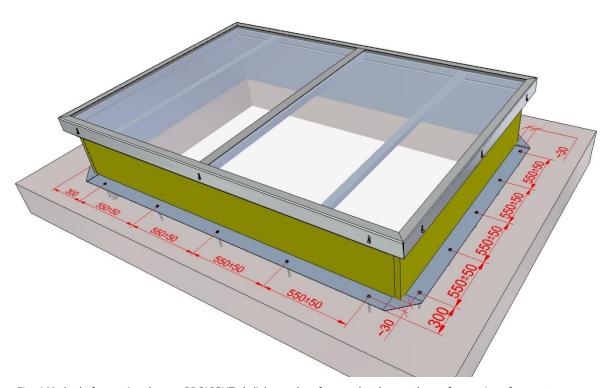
Method of mounting the mcr PROLIGHT skylights and roof access hatches on the roof — spacing of connectors.
